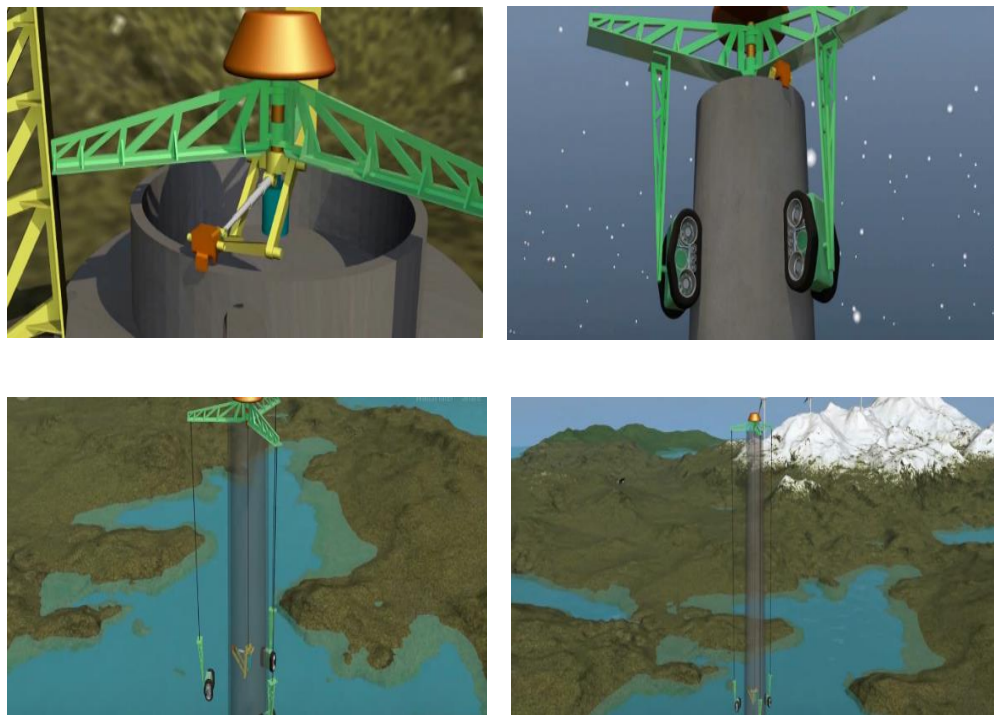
Proposed assembly for tower construction (Contour Crafting Co.'s Website. (n.d.)).
